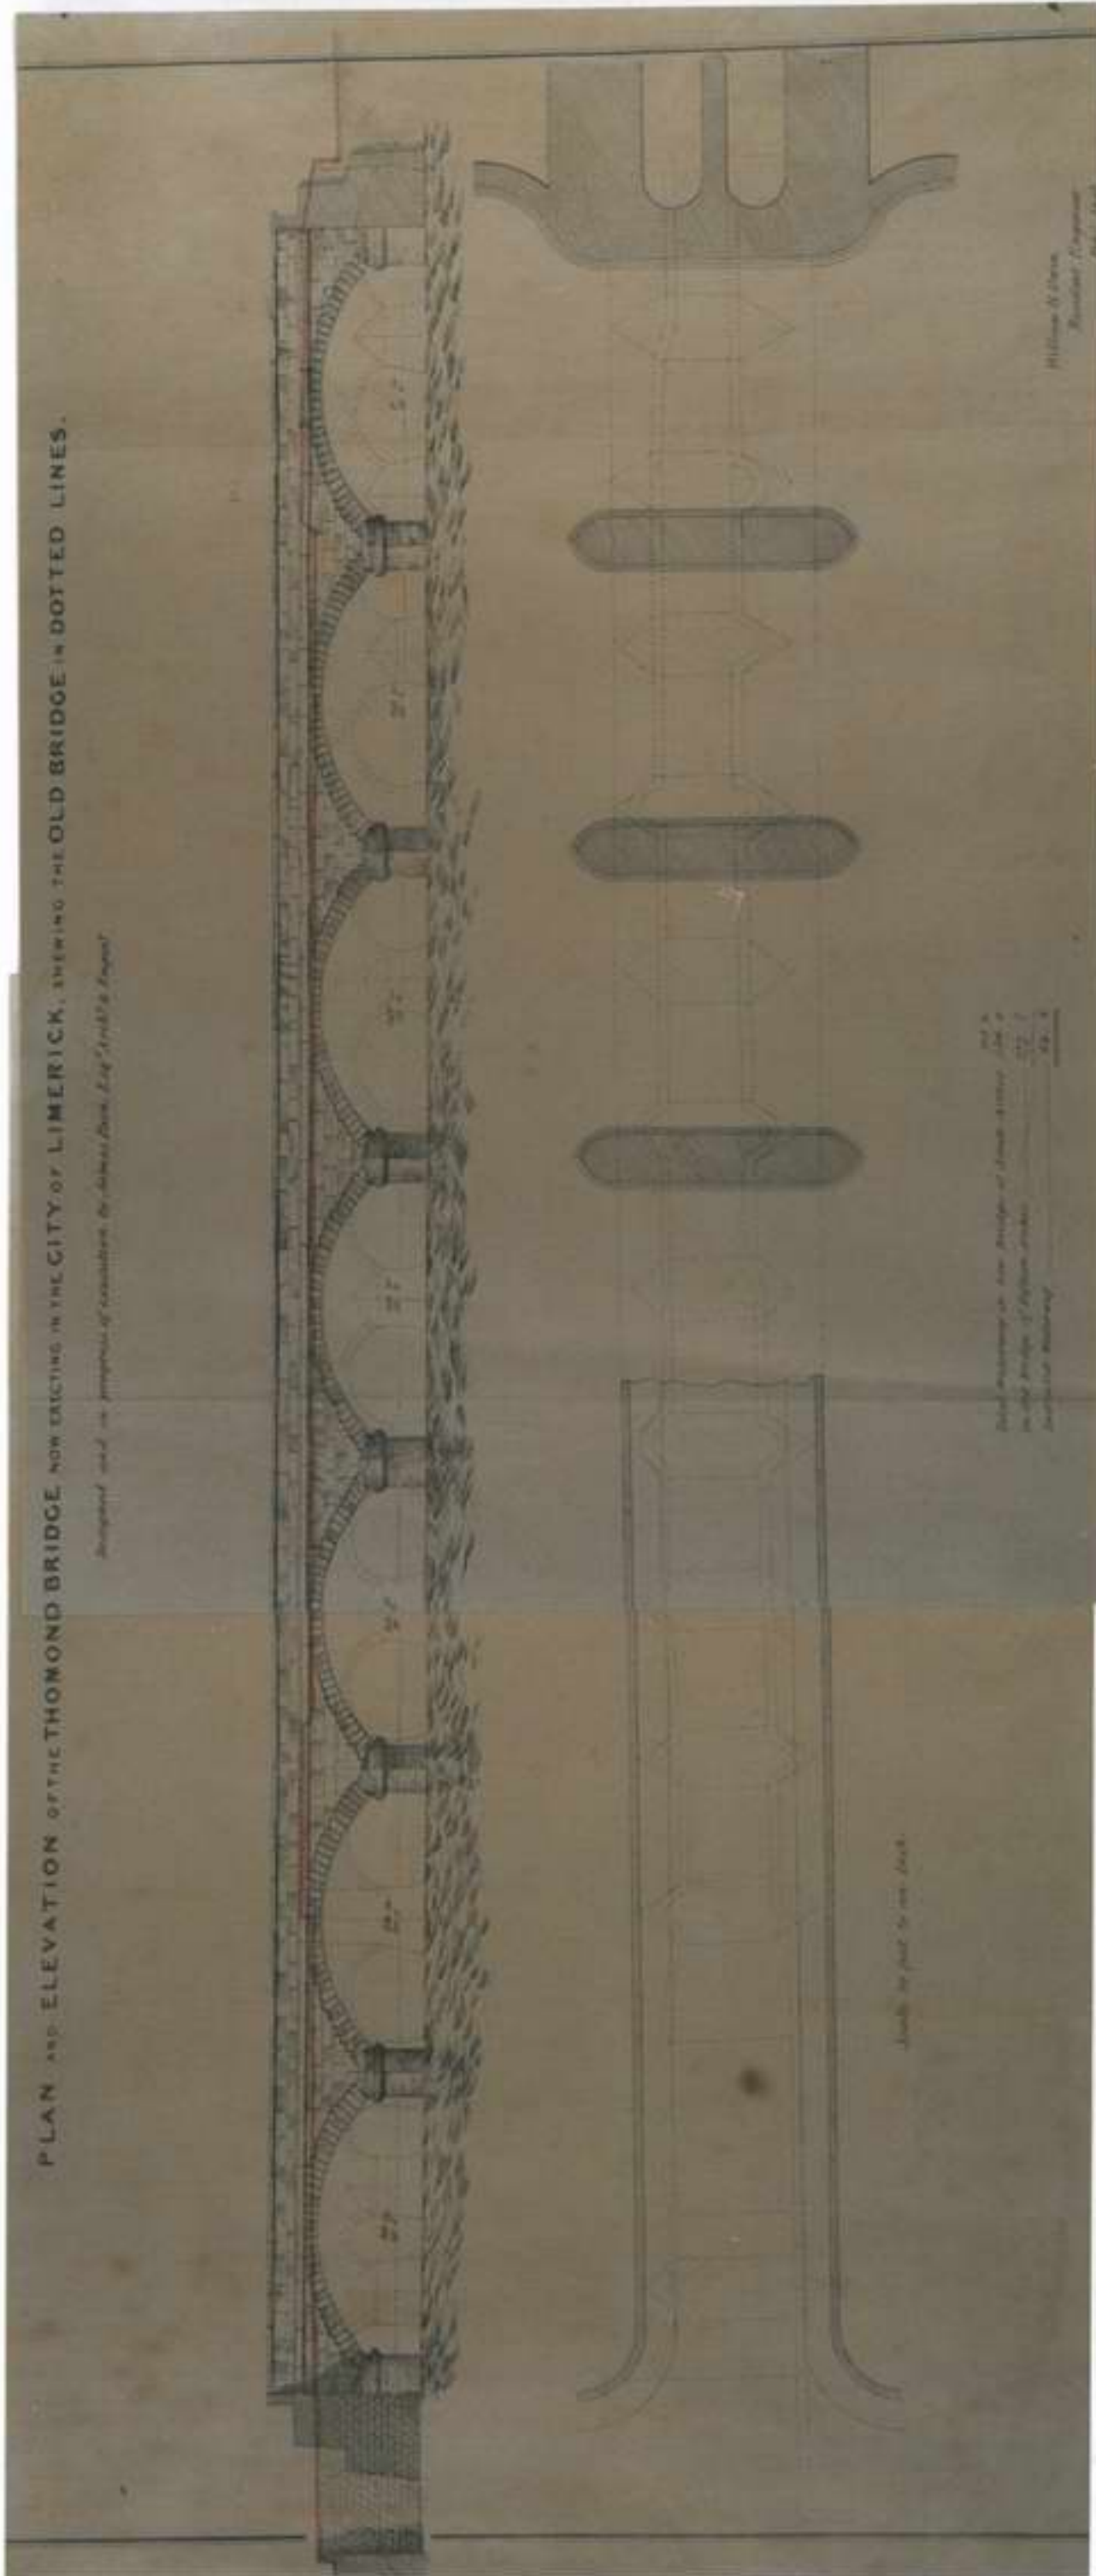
Thomond Bridge, Limerick. Plan and elevation (1837) by James and G. R. Pain.
